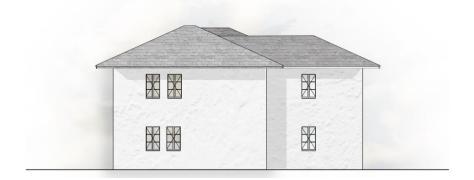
Beqiri, A. (2024), Adem Zeko House Elevations
